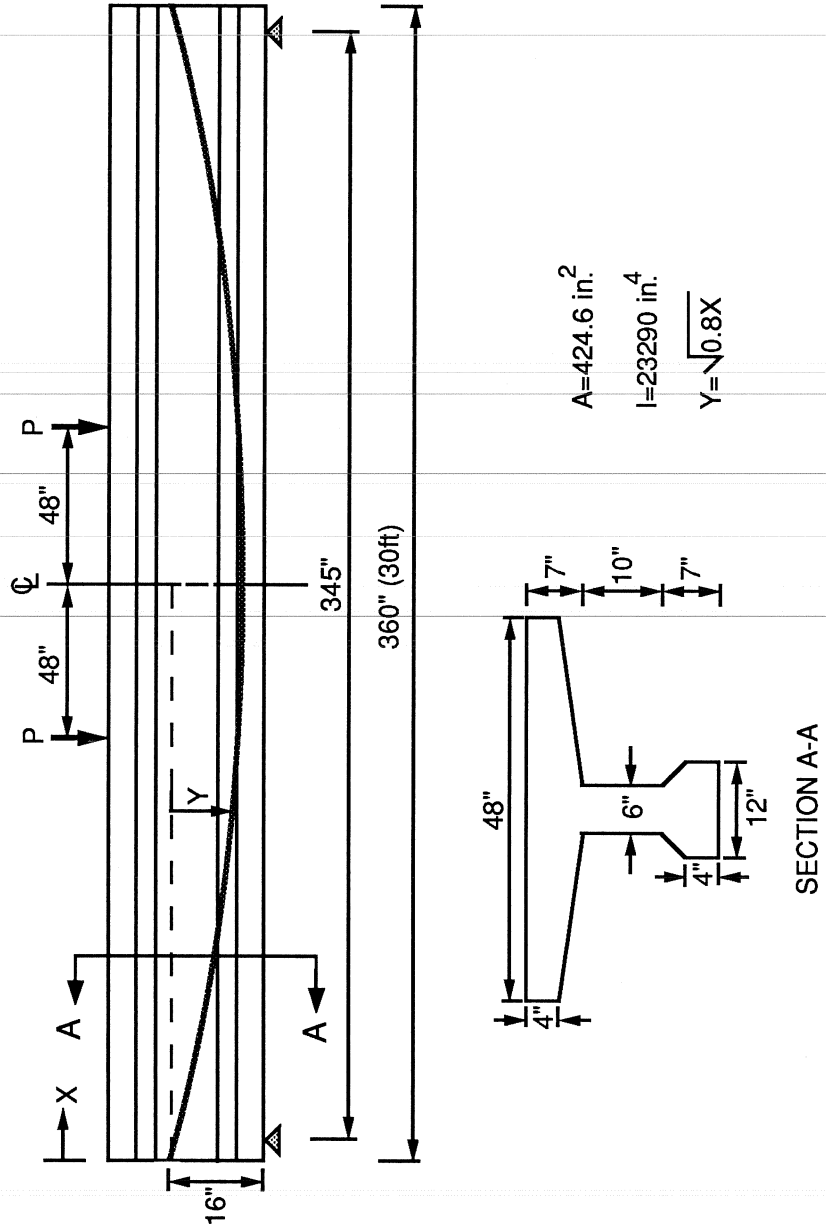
Large-Scale Beam with Parabolic Tendon
